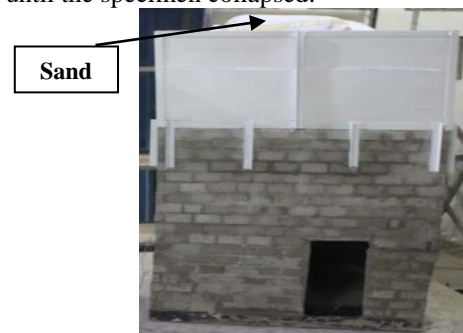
Specimen with additional uniform load using sacks filled with sand (sandbags)
